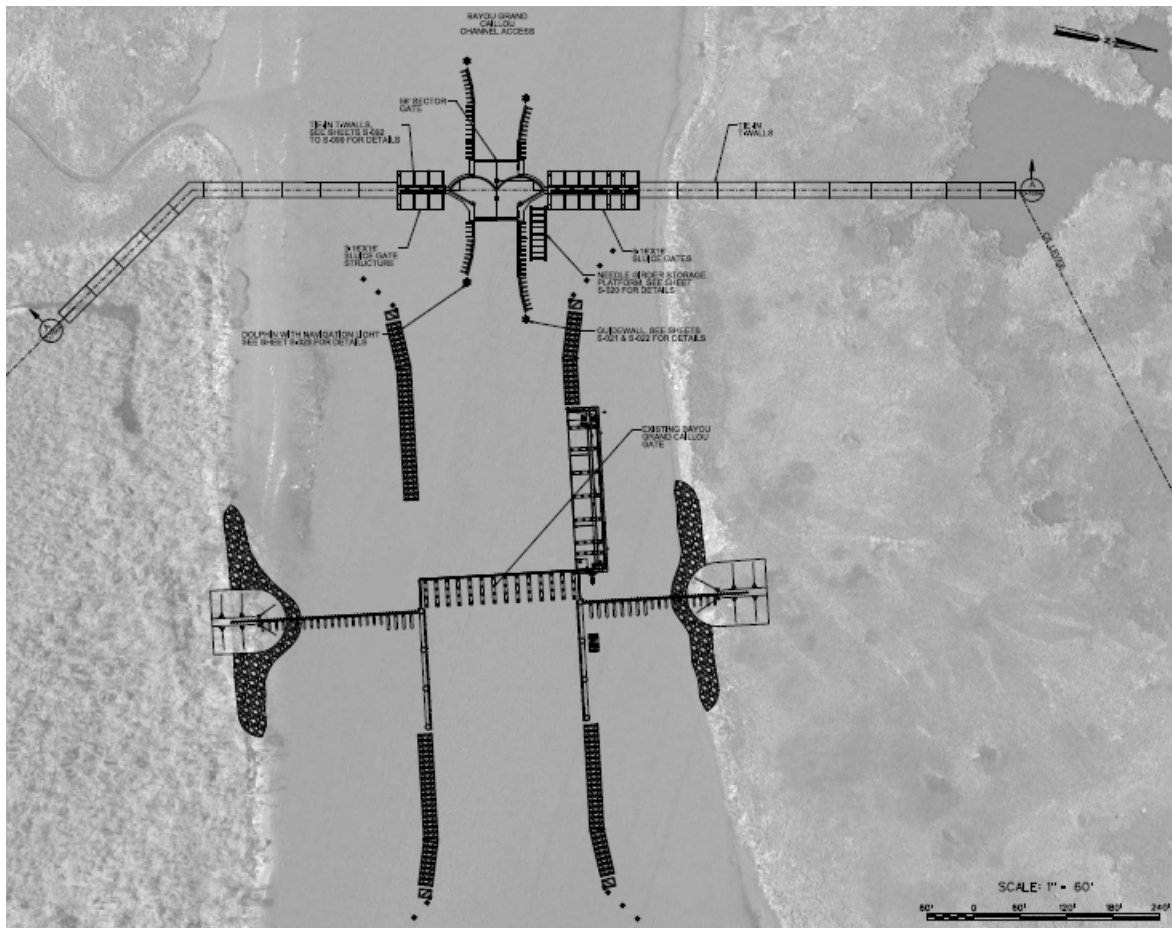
Example 56-ft Sector Gate Site Plan (Bayou Grand Caillou)
